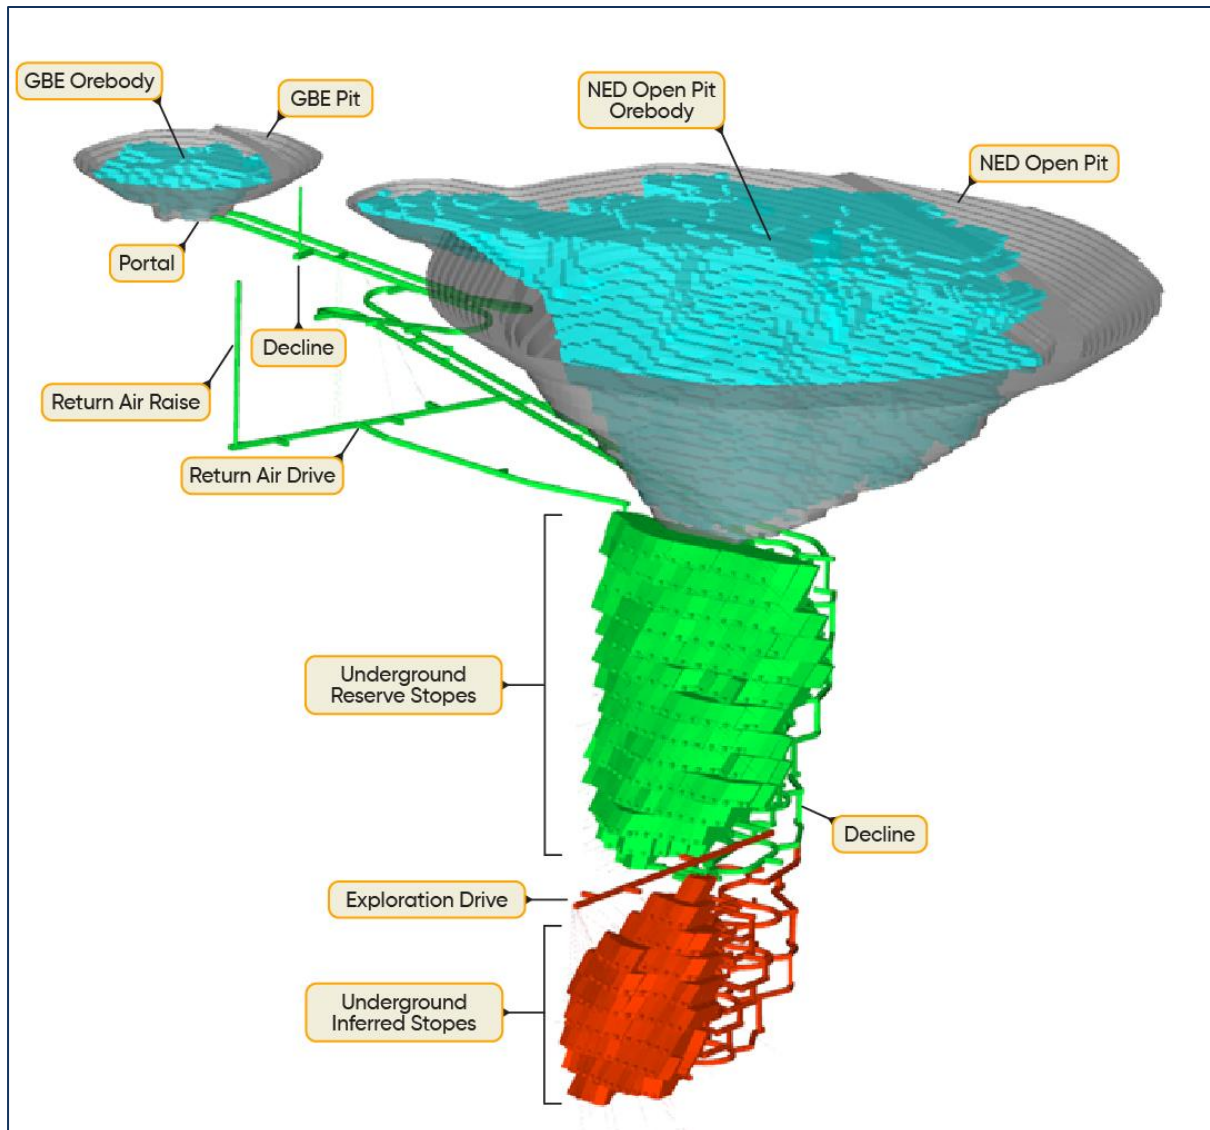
Underground Mine Elevation with GBE and NEB Pits looking East
